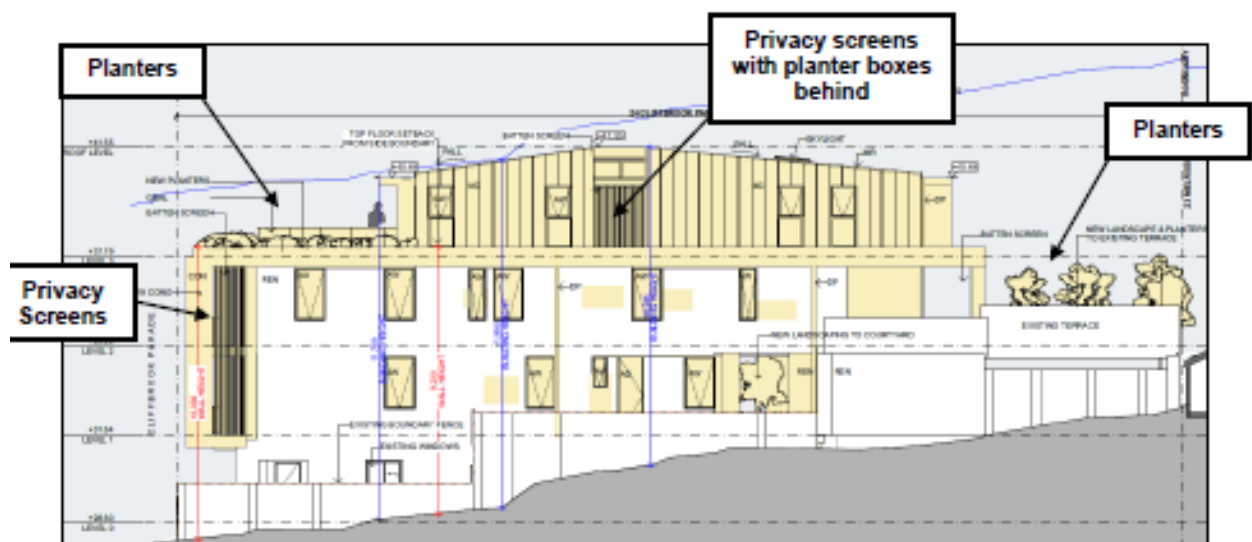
Excerpt East Elevation, illustrating overlooking mitigation from recessed Unit 4 terrace and courtyard, plus Unit 3 terrace, provided with landscape planters and balconies provided with privacy screens
